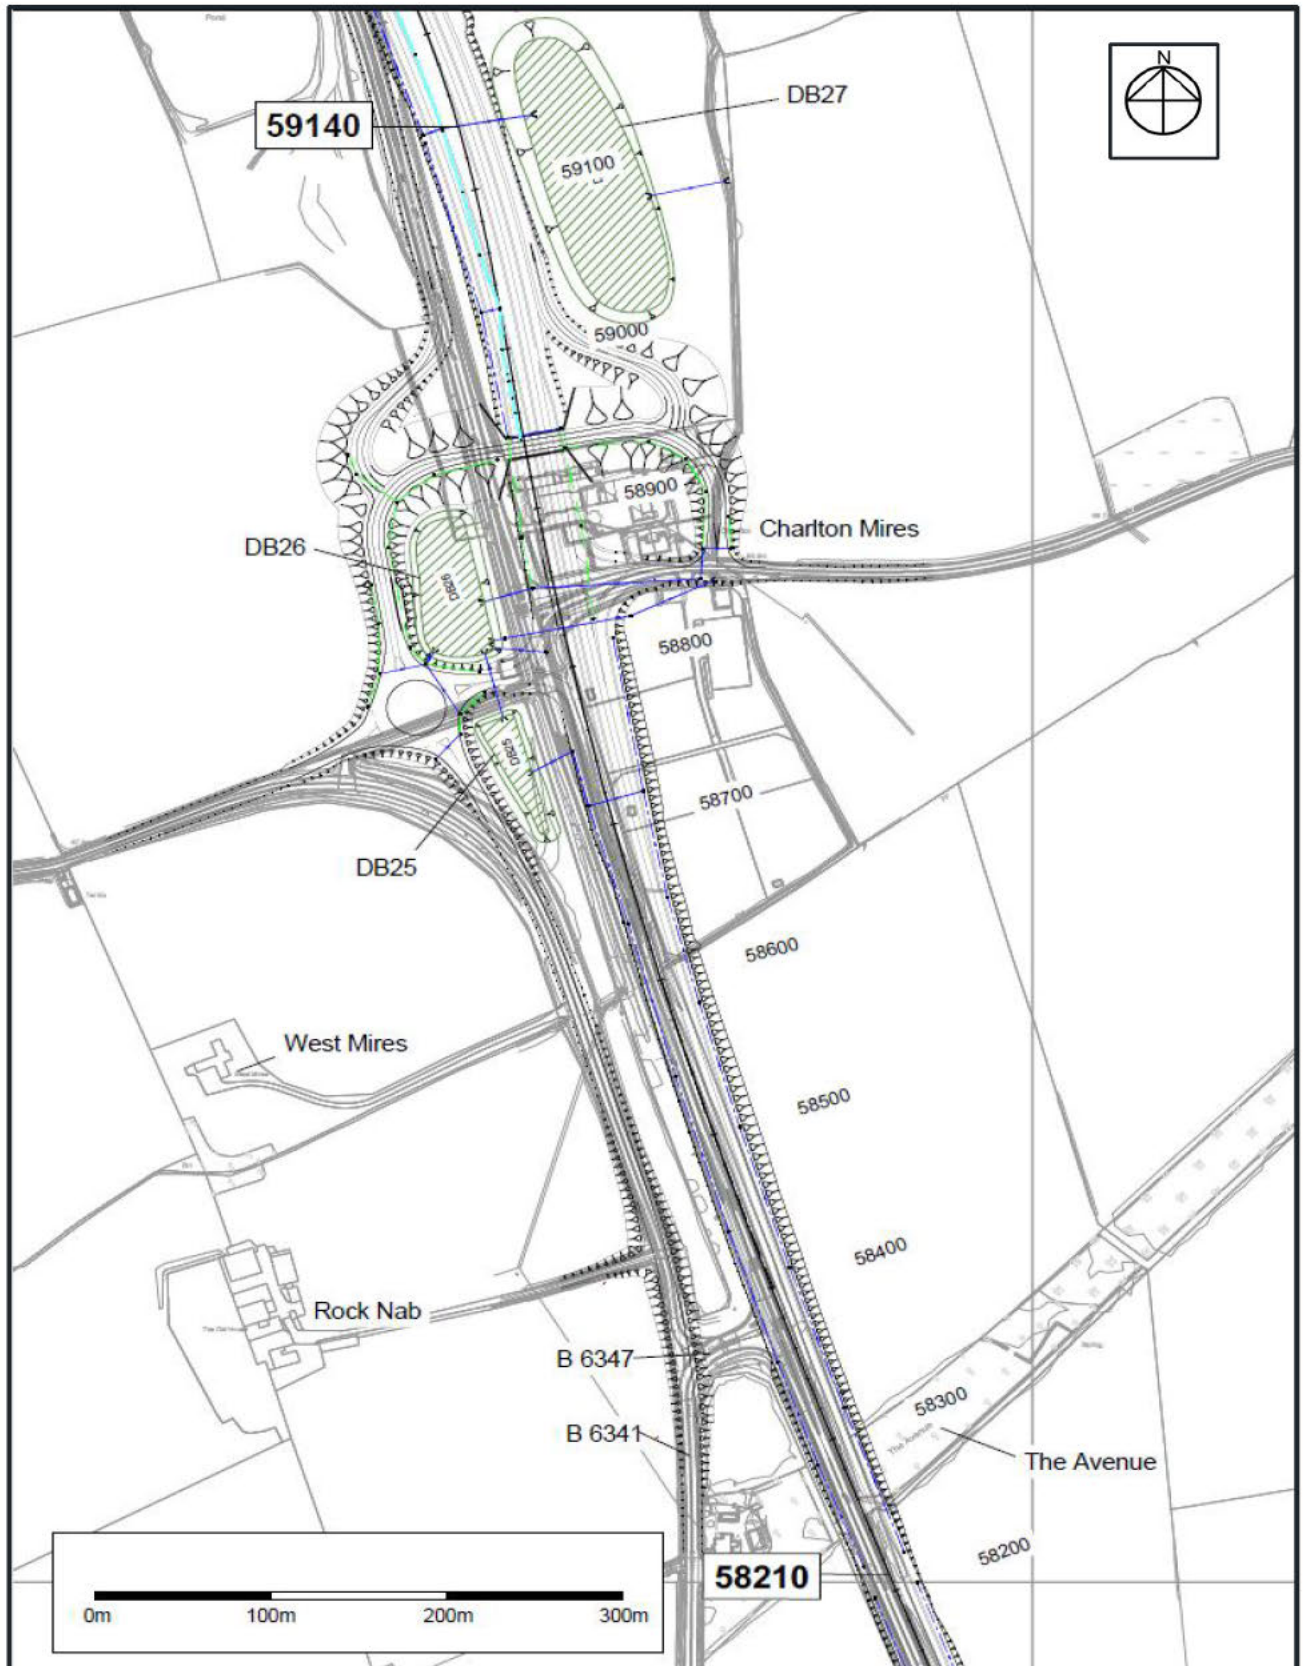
Highway Drainage Layout and Detention Basins DB25 and DB26
